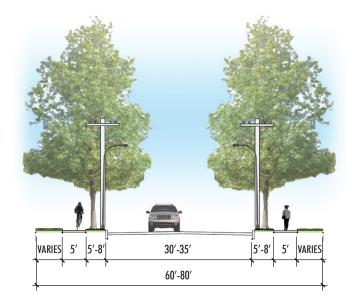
The Hub: Zone 4 Existing Conditions Section and Plan
